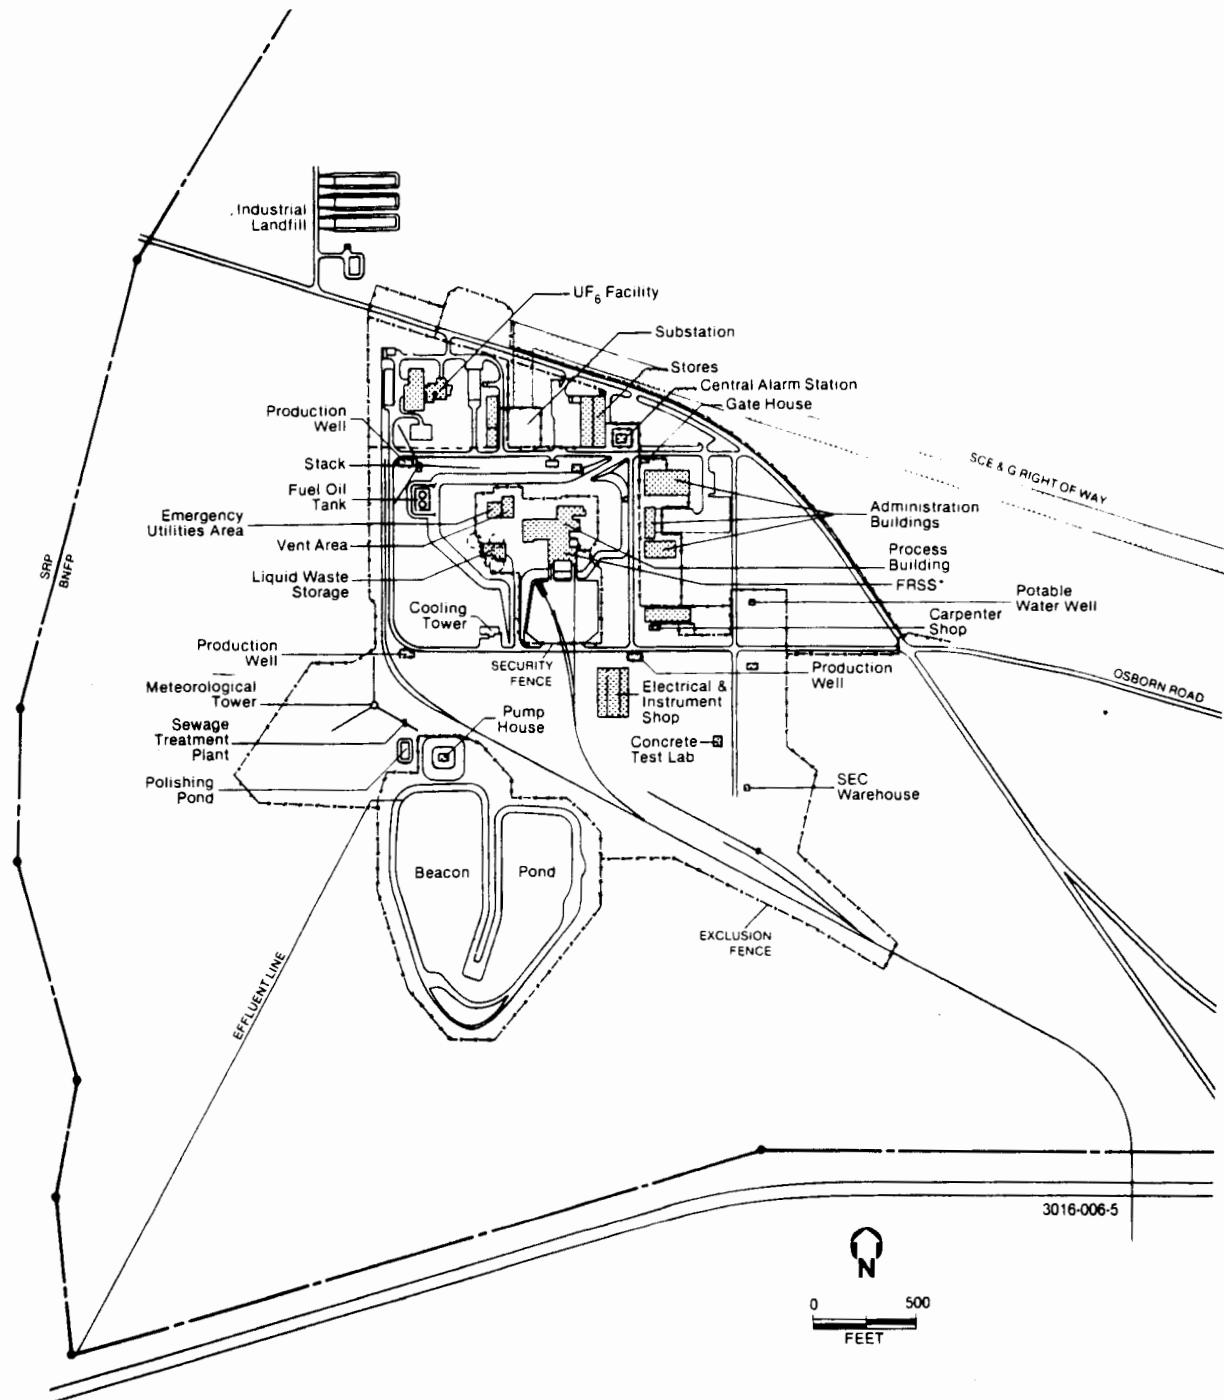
Plot Plan of the Barnwell Plant (AGNS 1981)
